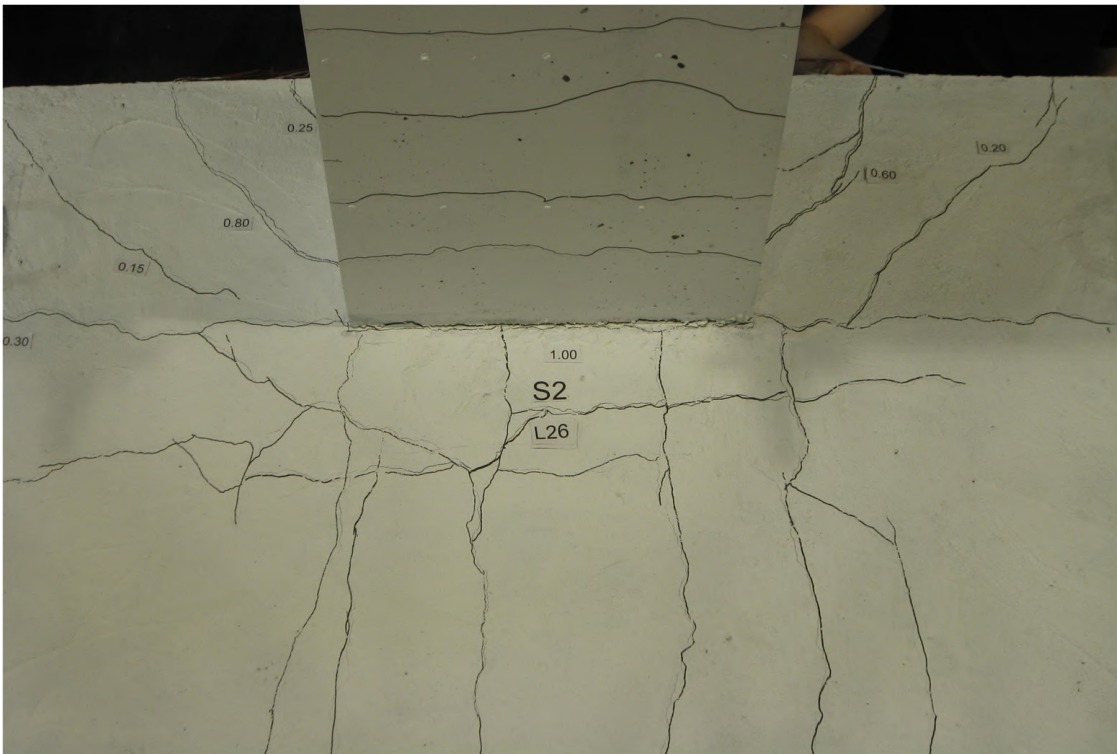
Specimen 2 slab cracks at $V = 275.0$ kN
